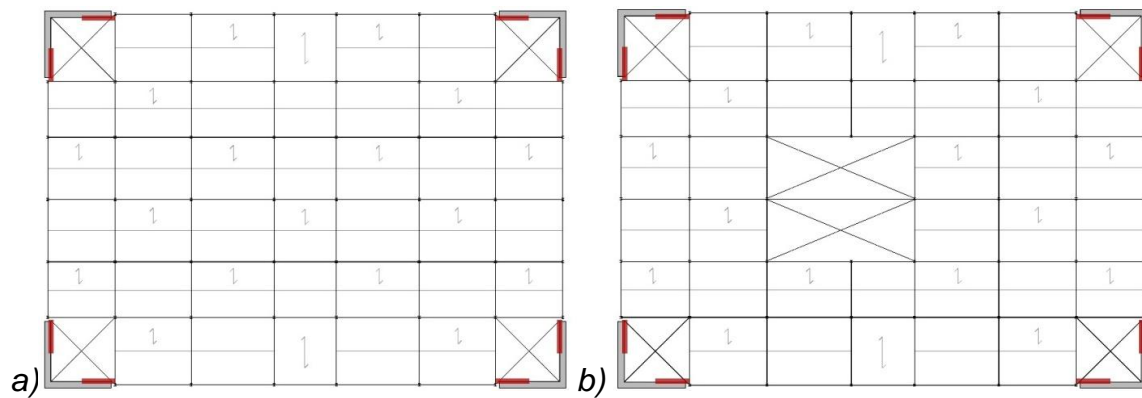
Typical plan dispositions: a) P1, b) P2 and P3.
